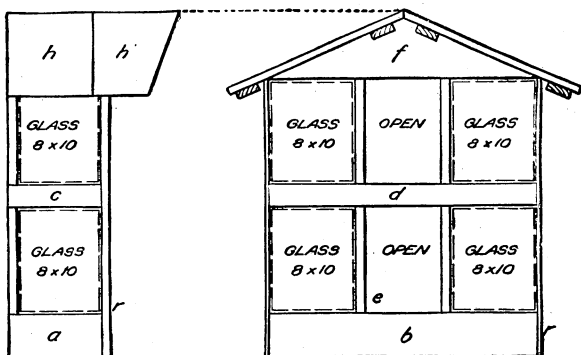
Front and side elevations of shelter shown in figure 42.
